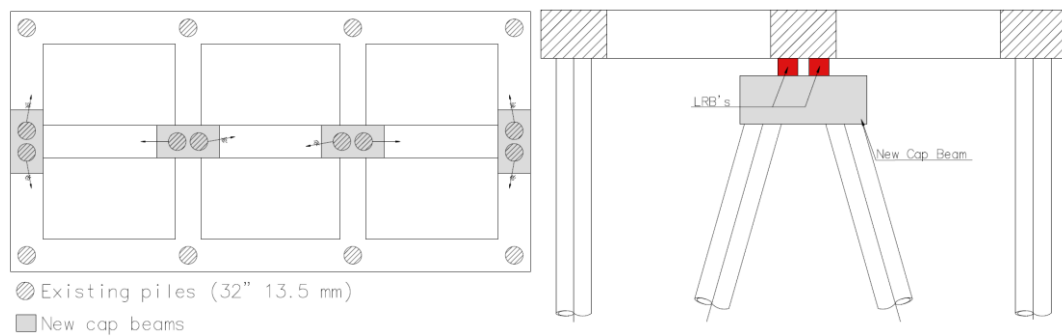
Plan and cross-section of the proposed lead rubber bearing retrofitting system
